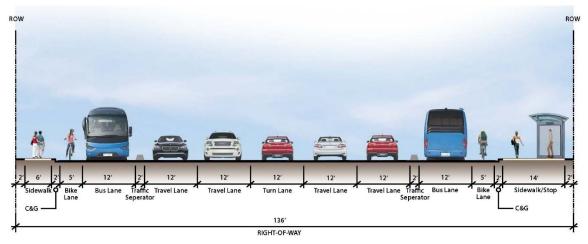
Currently Recommended Roadway Cross-Sections for South Cobb Drive
